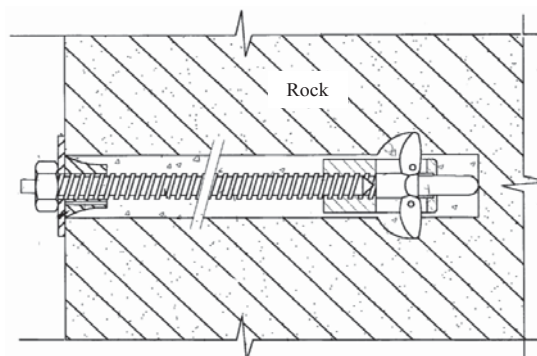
A rock bolt whose cutting blades have expanded in the borehole [67]
